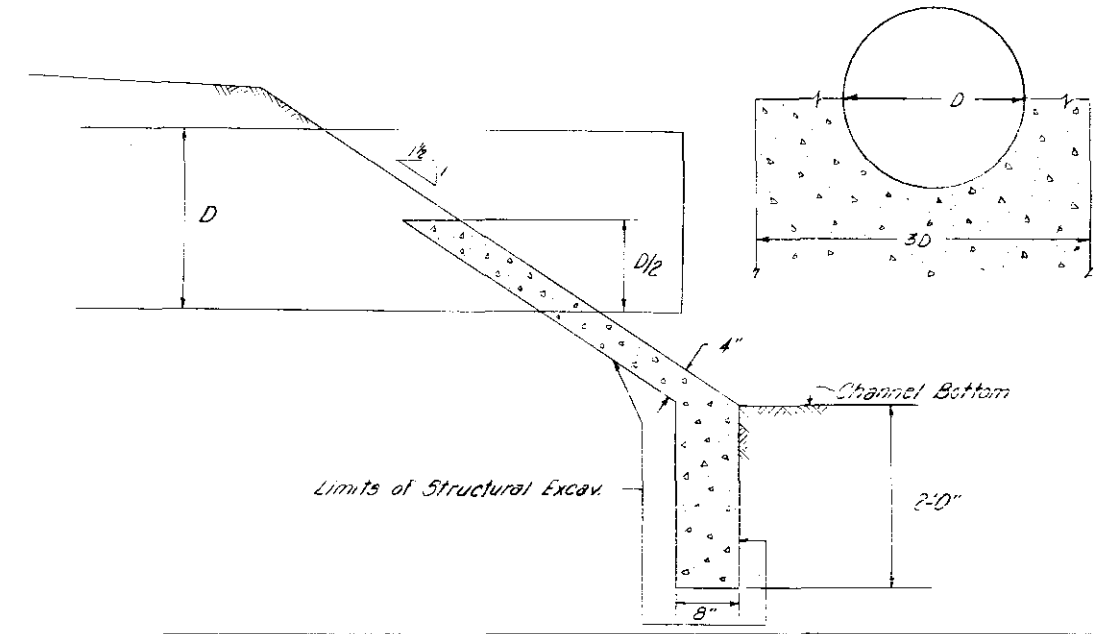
DETAIL OF CONC. PAVED RUNDOWN STA. 481+
